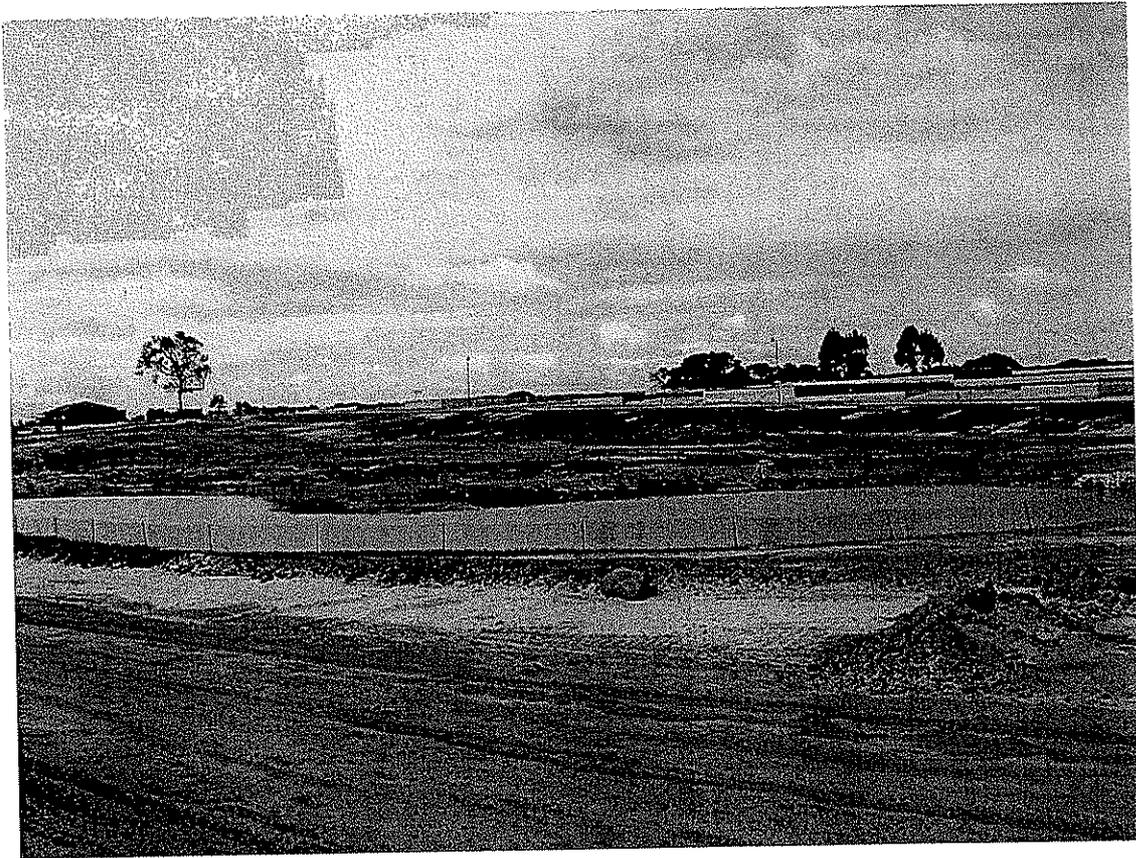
Drainage basin on the south side of Lancaster Road, opposite the subject site.
